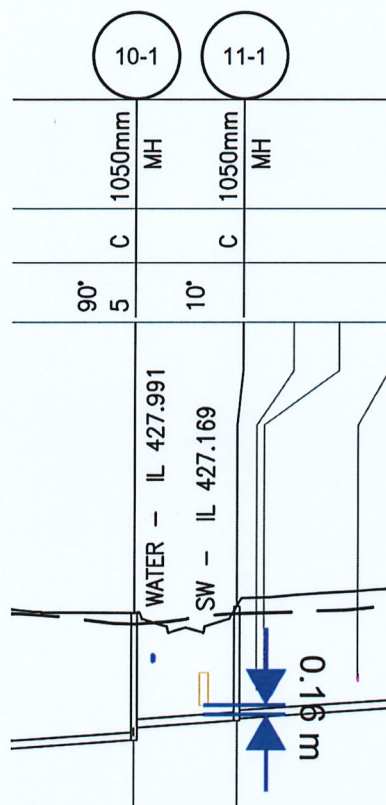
Extract from Sewer Longitudinal Section from Manhole 10/1 to 11/1
